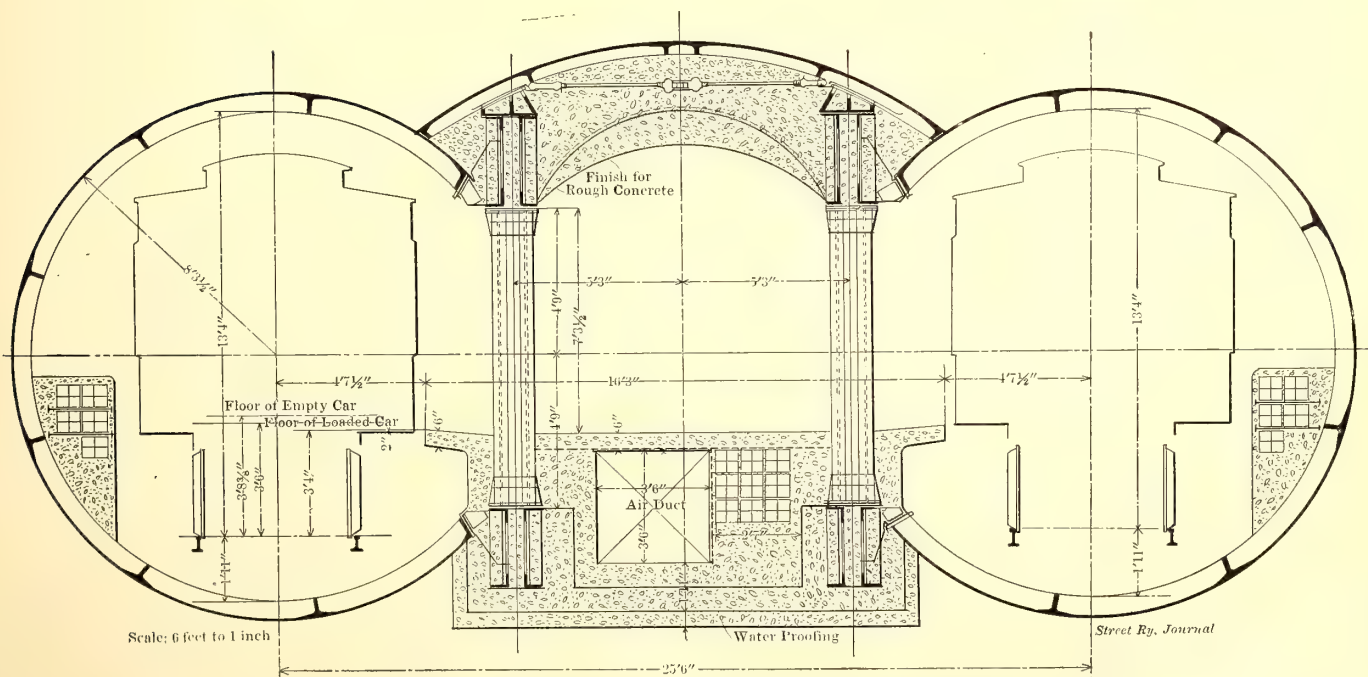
CROSS-SECTION THROUGH THE HUDSON STREET STATION, NEW YORK
